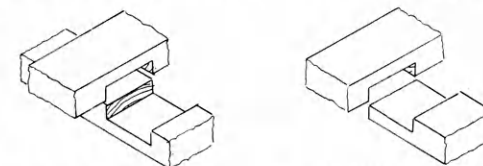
Surface Cross Lap Joint Fig. 8 Midlap Joint
